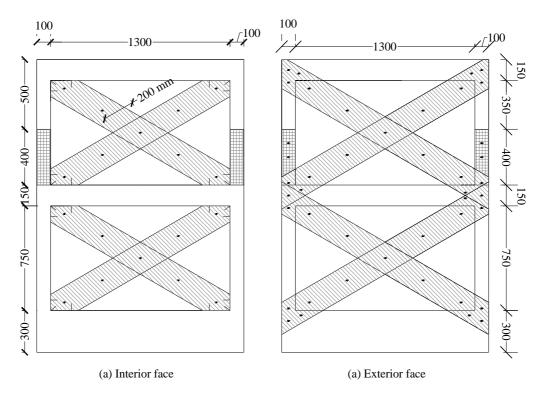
Location of Anchor Dowels in Specimen SP-4
